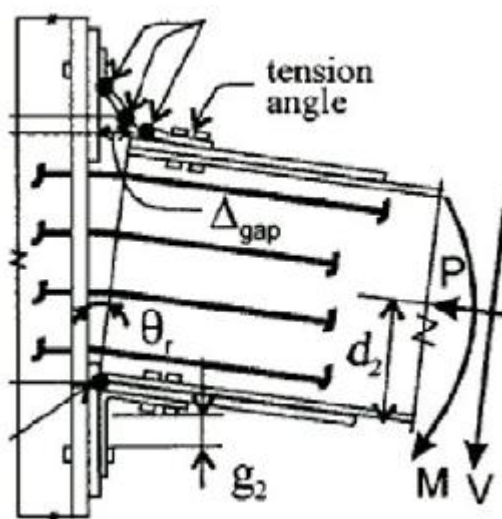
Application of post-tensioned cables in beam-to-column connections (Kurama, 2006)
